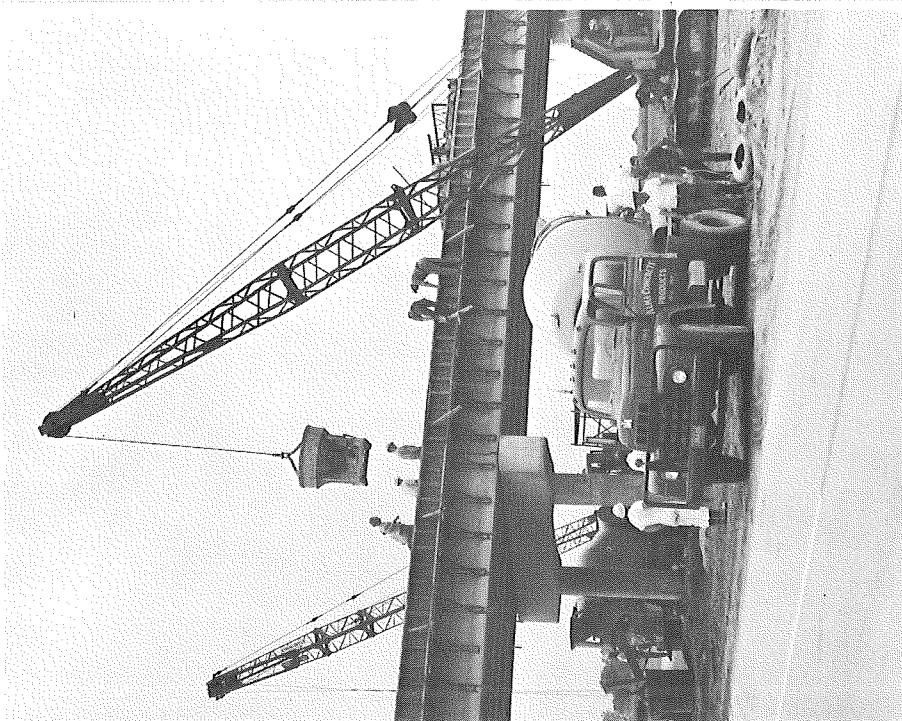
View of elevating, placing, and finishing concrete at the Coe Rd. site.
